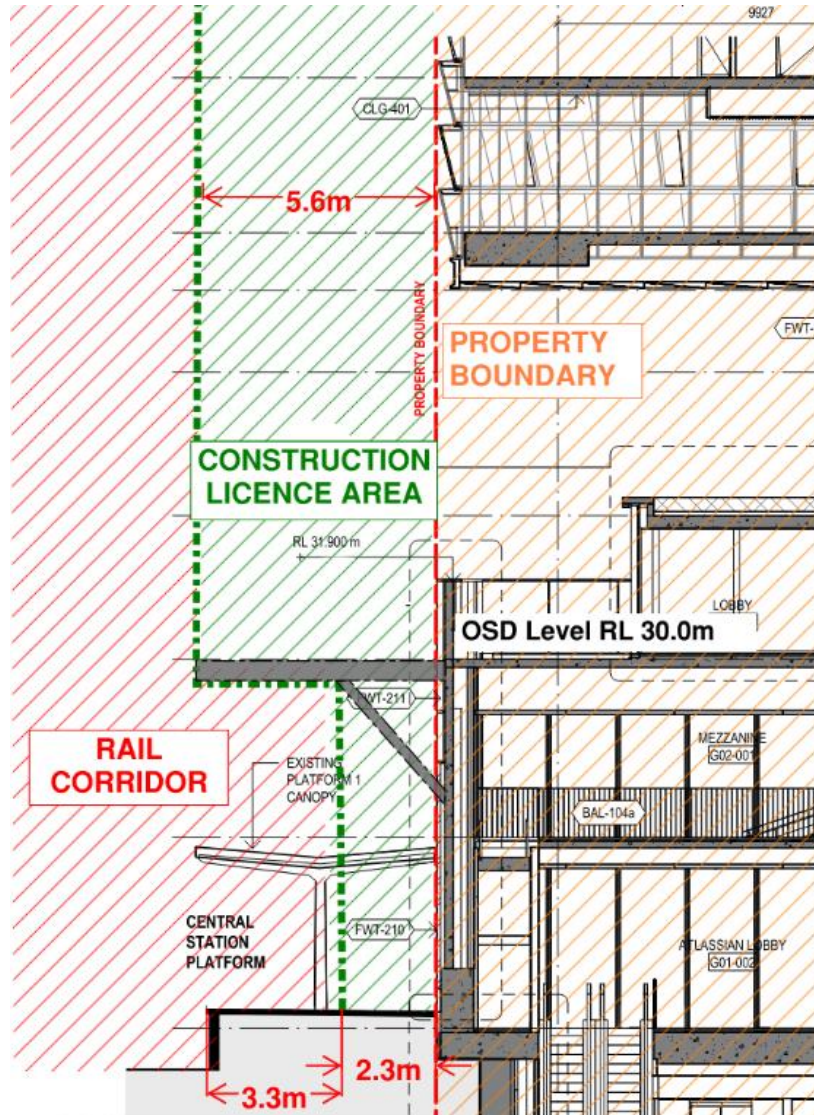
Section through Eastern Elevation showing Construction License Area
